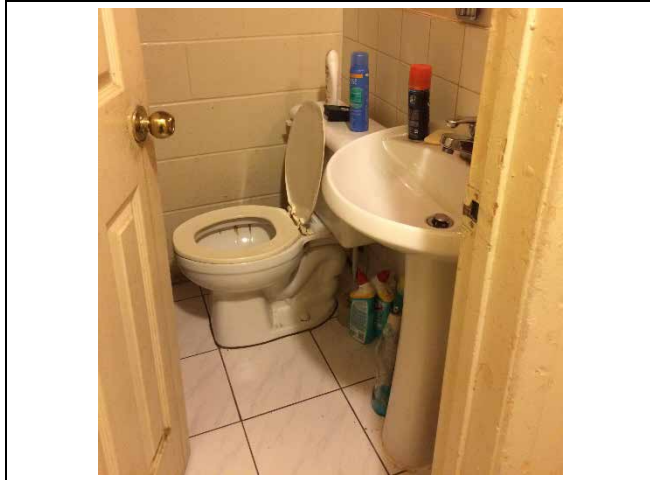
Presumed asbestos-containing ceramic tile grout and mortar/adhesive observed to be in good condition on the walls and floor of the basement level washroom.
